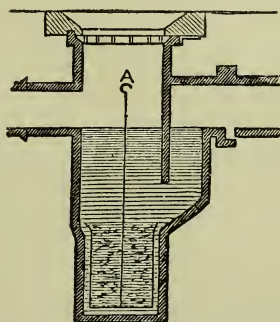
Dean's Gully Trap. A, Handle of movable bucket.
